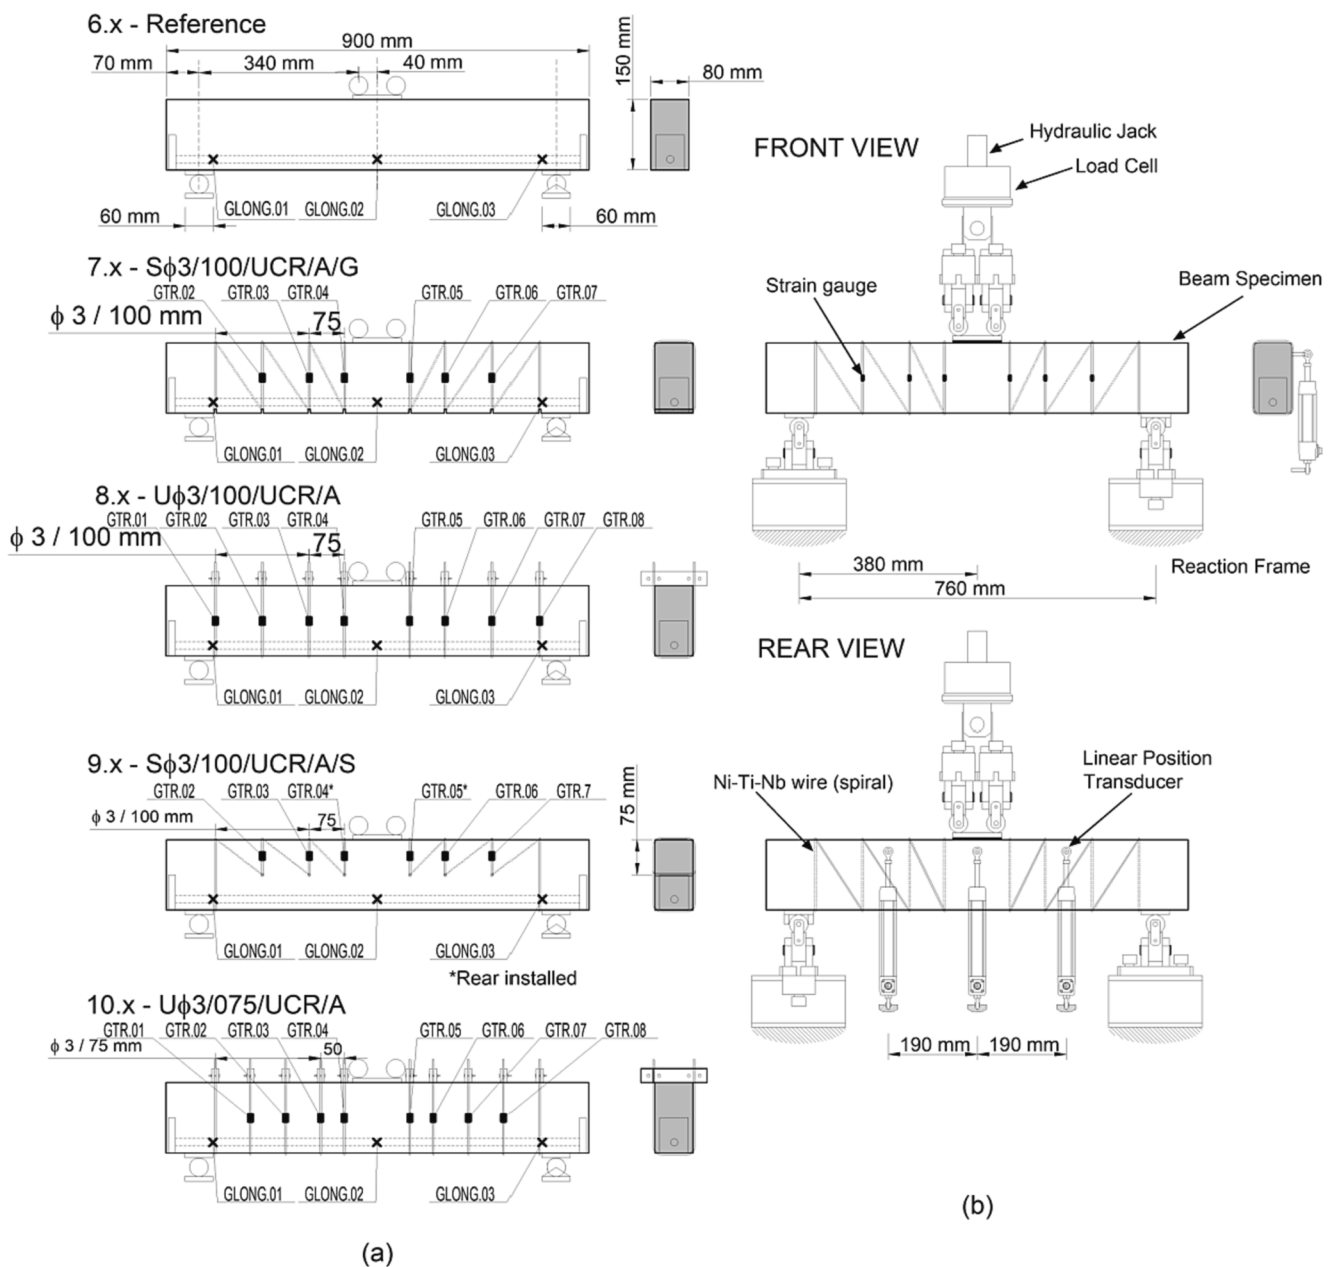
(a) Beam geometry and strain-gauge positions of the beams tested in the second phase. (b) Test setup.
